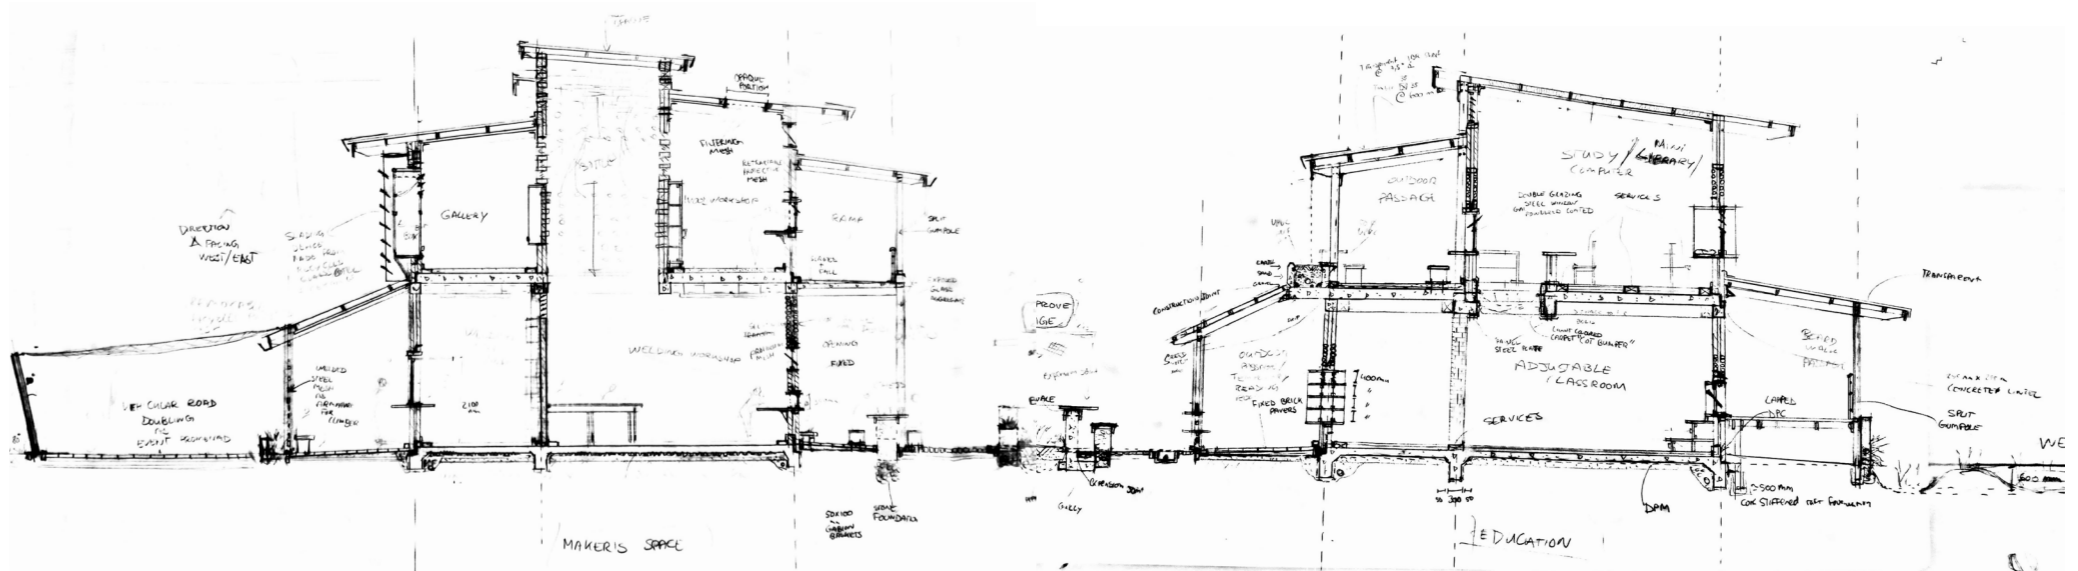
1:50 sketch section through Maker's space and afterschool centre (Author 2021)
